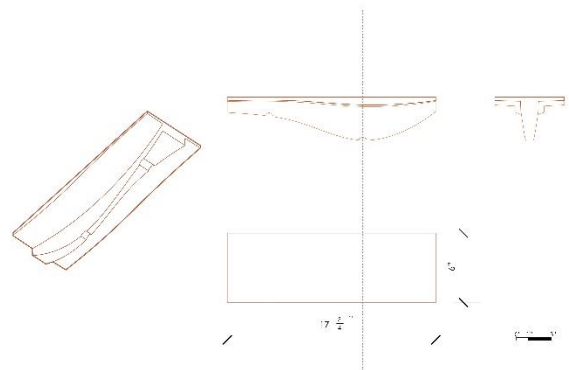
Final beam design and dimensions; worm's eye view, elevations, and plan with support point locations.
